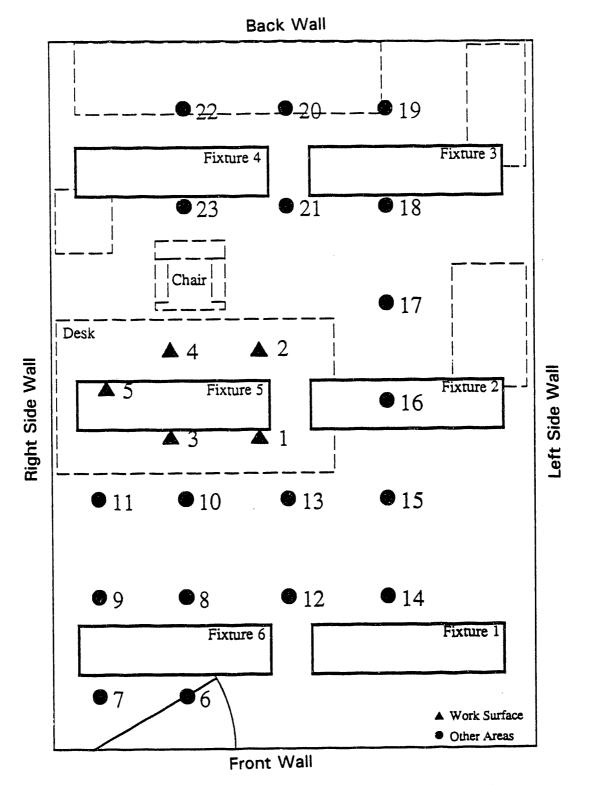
Test Room Layout, Fixtures and Measurement Points
